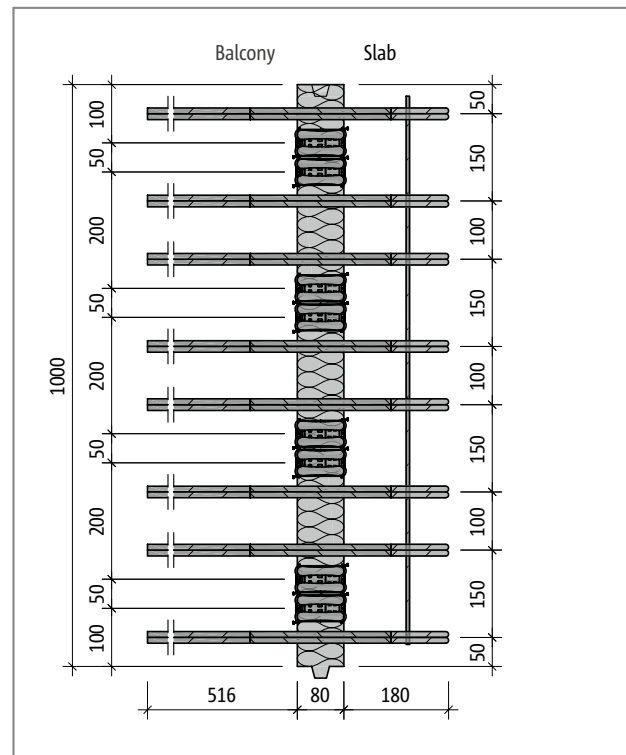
Schöck Isokorb® T type Q-E-W-VV5: Product layout
